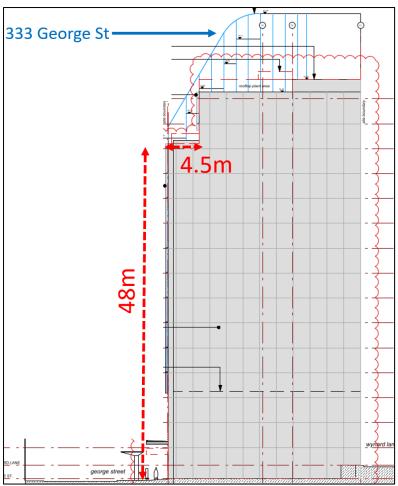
George Street elevation with dotted red line indicating approximate street frontage height
